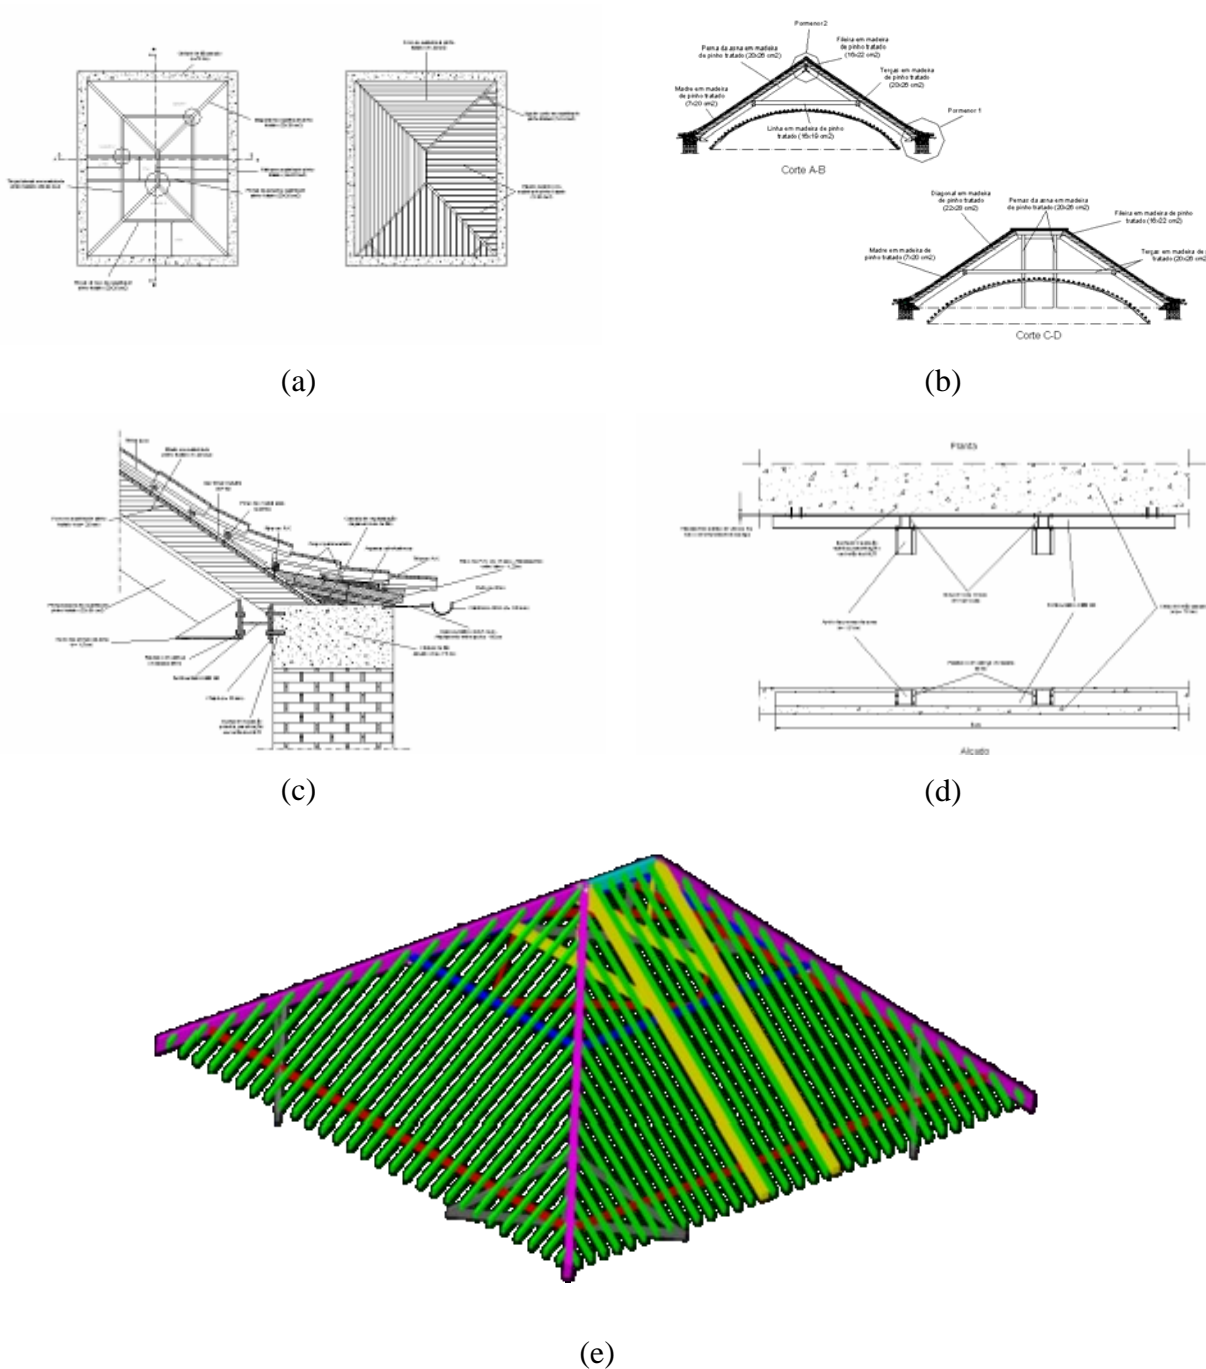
Details of the replacing roof structure: (a) structure (plan, sheathing and strips); (b) sections AB and CD; (c) detail of the central truss support; (d) steel beam for central truss support; (e) 3D model of the new roof
